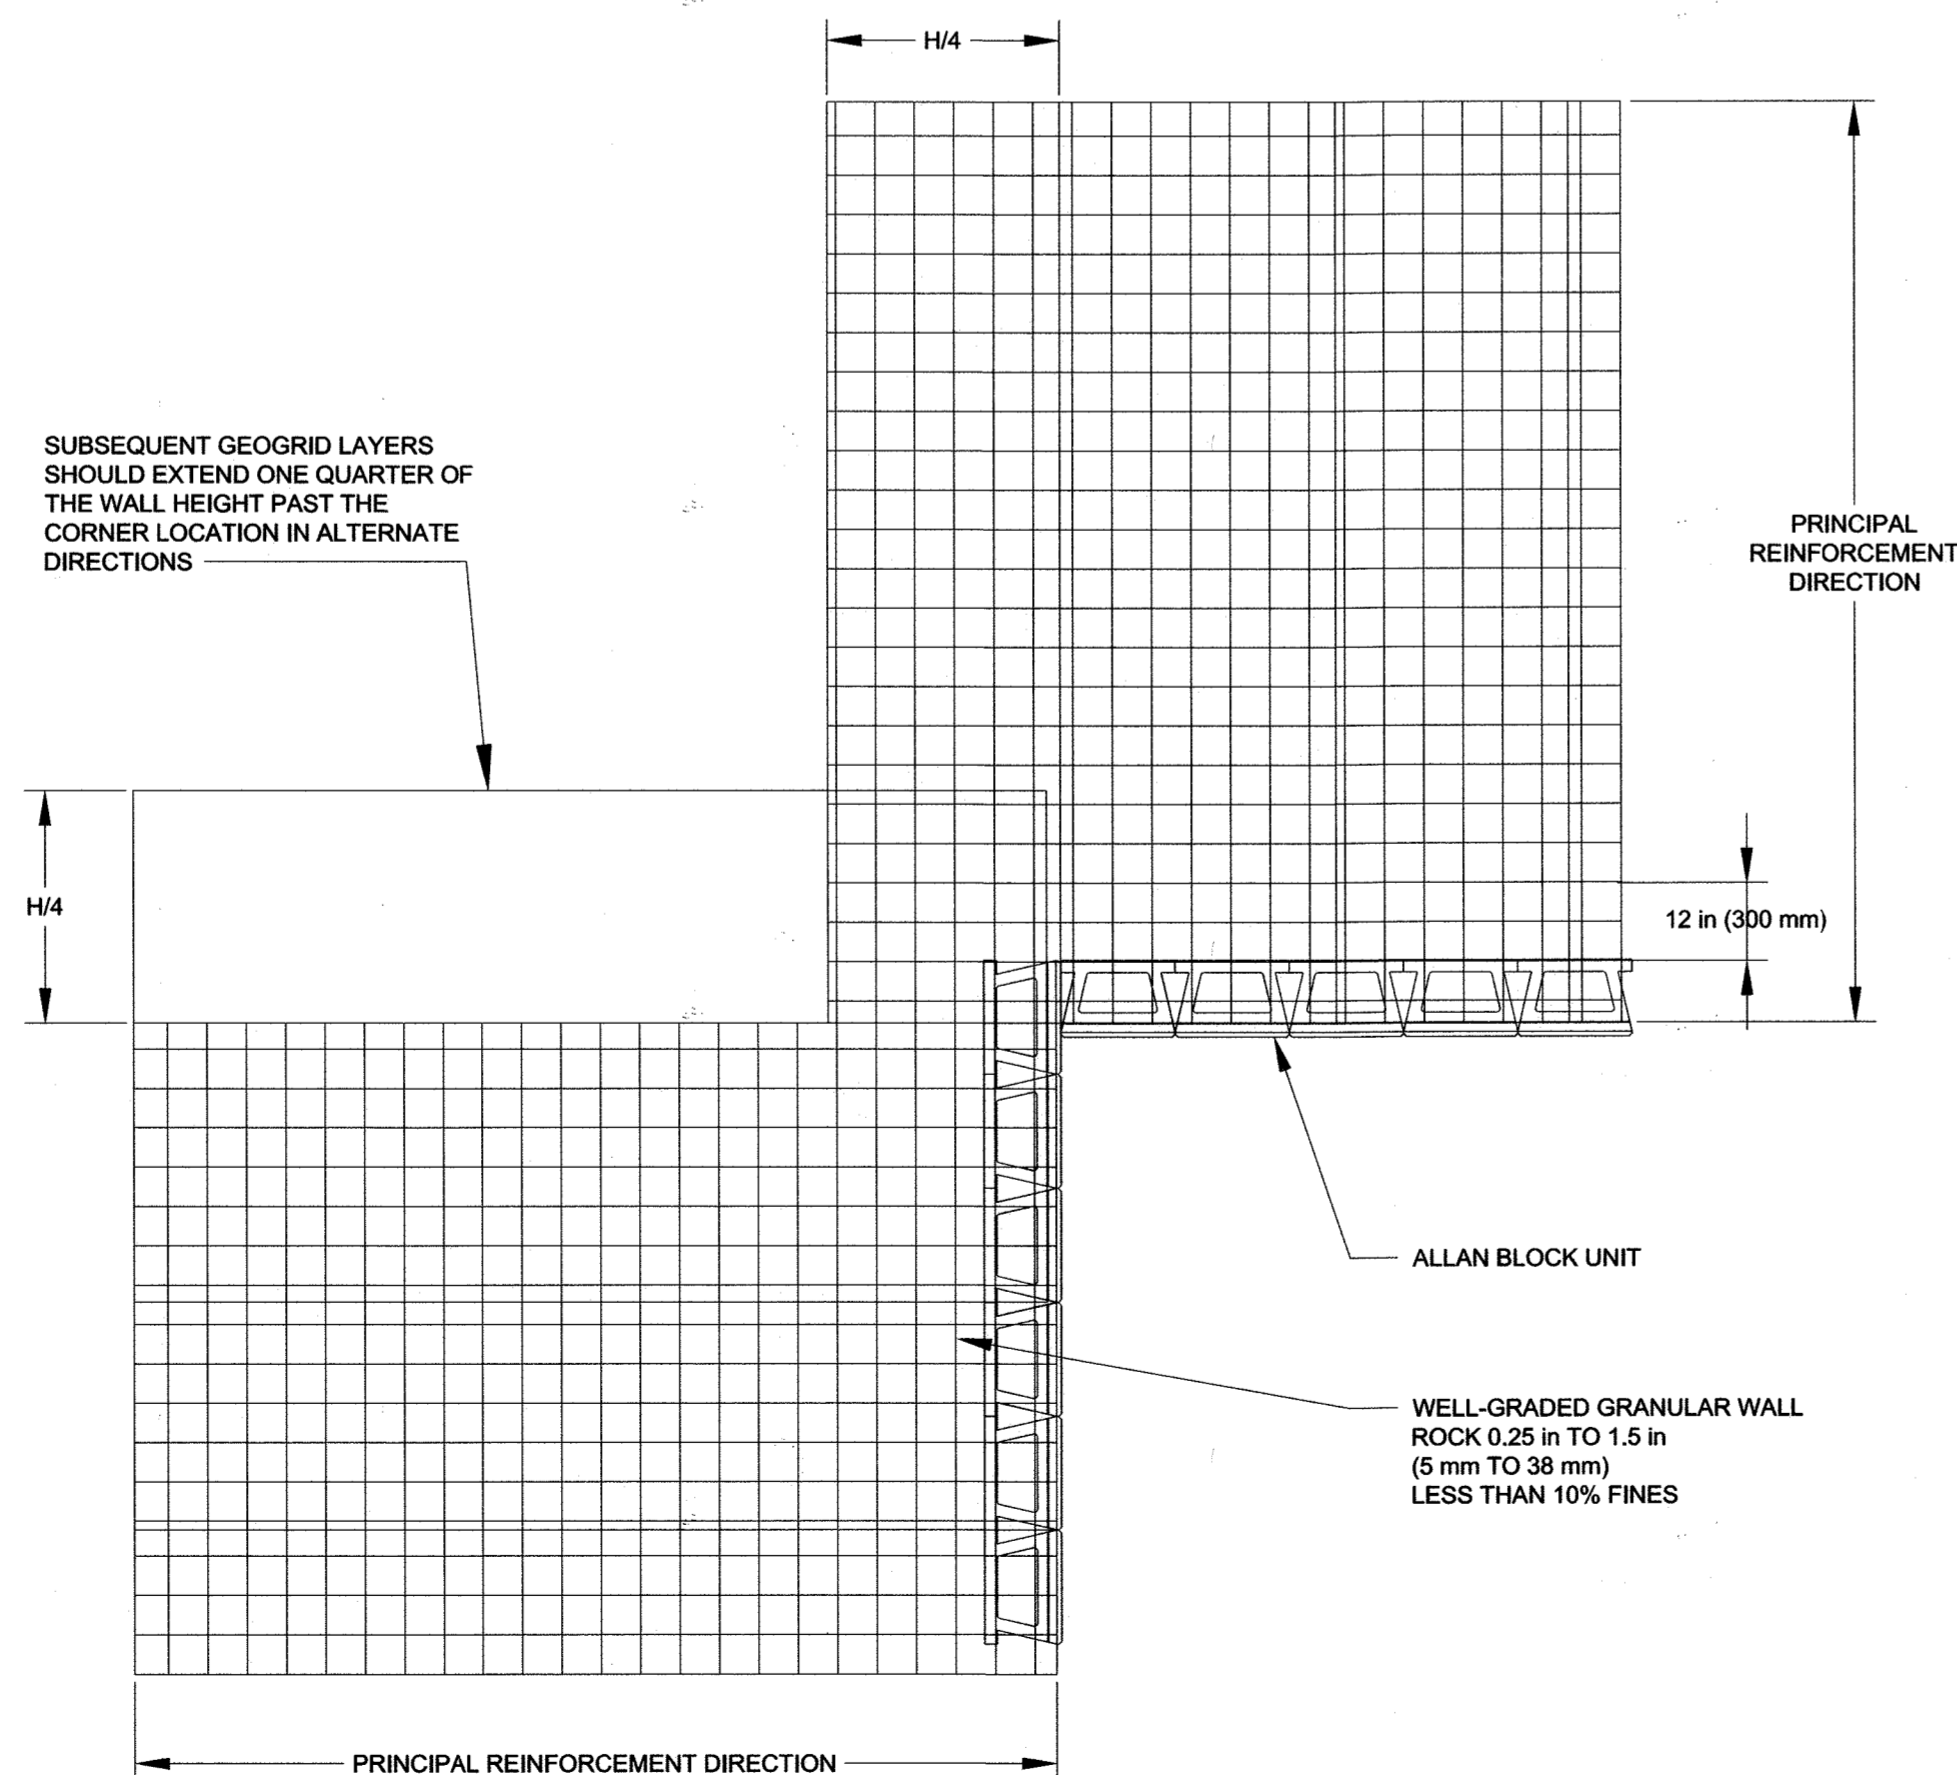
TYPICAL REINFORCED WALL APPLICATION
